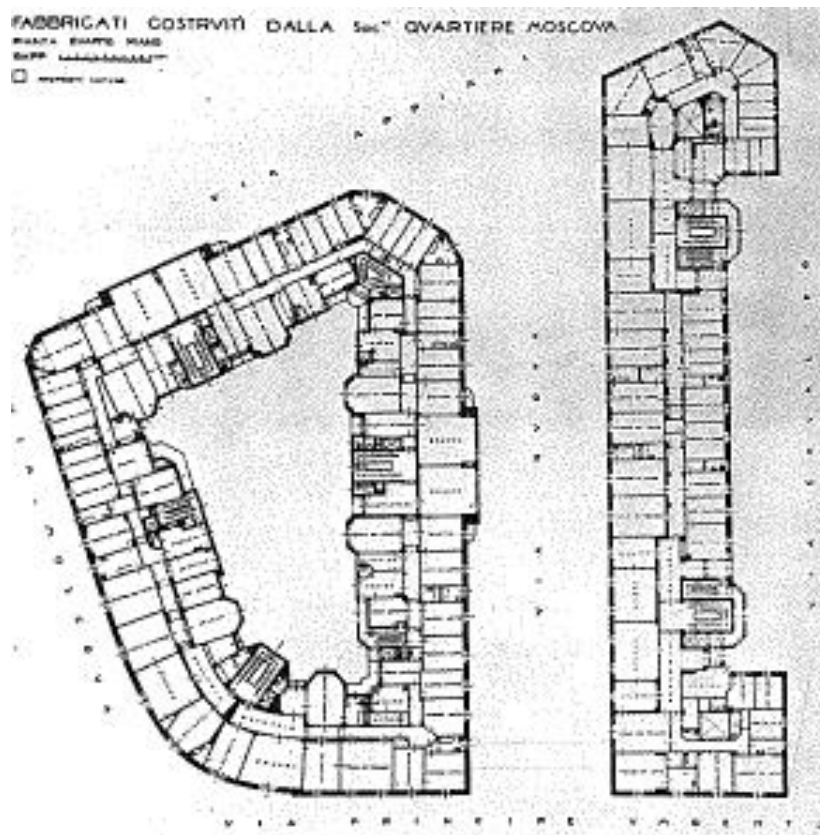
Giovanni Muzio: Typical floor plan of Ca' Brutta. Milan, 1922.
